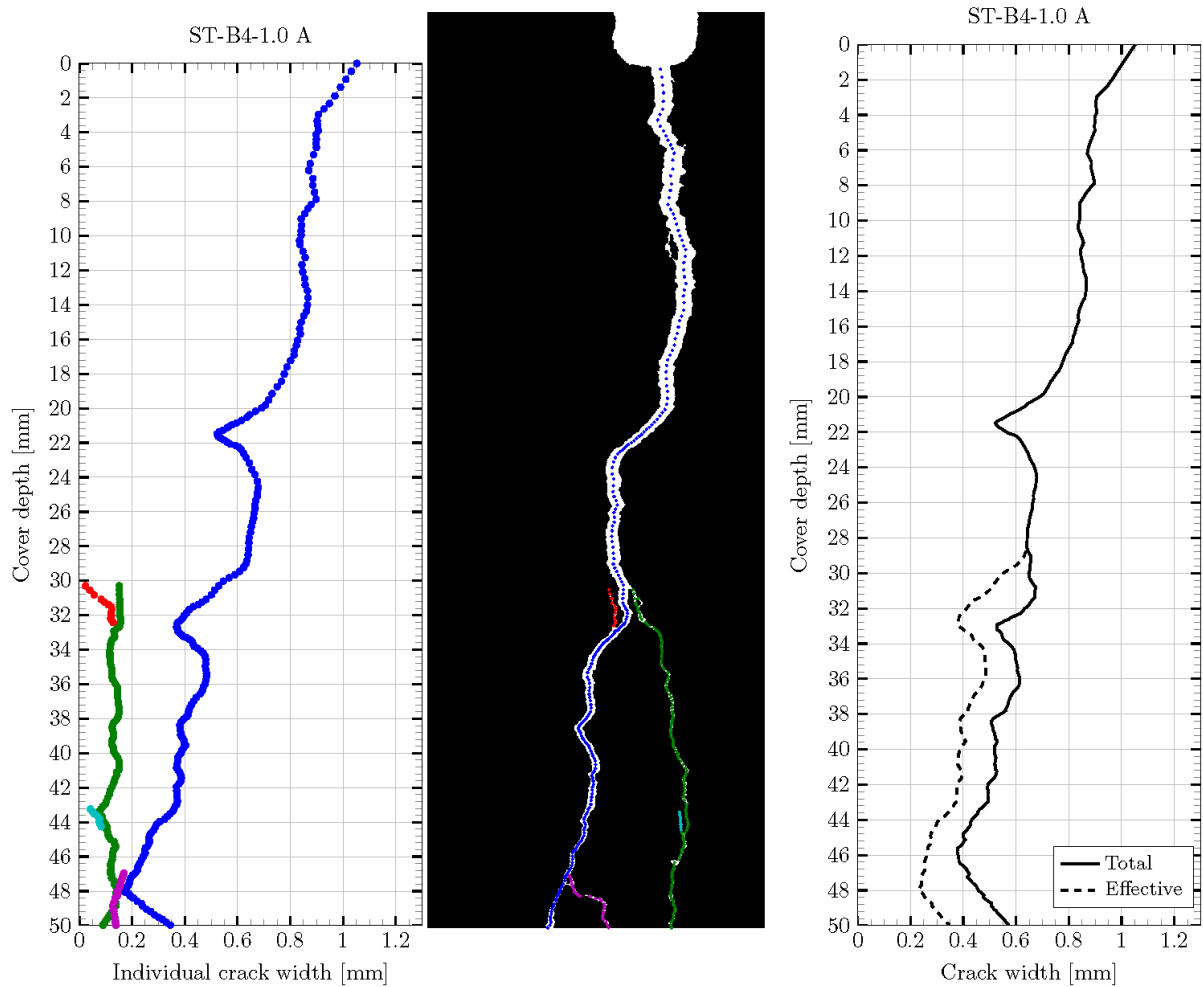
Example of crack pattern and crack measurement for a SFRC sample loaded to crack tip width of 1.0 mm.
